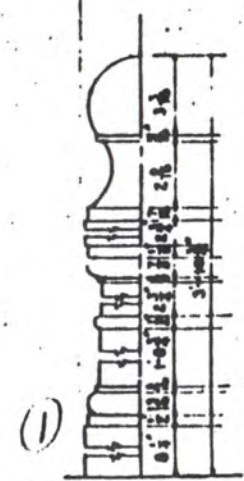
/2 ELEV. OF START NEWEL 2ND FLOOR STAIRS TO ATTIC SCALE 3/4" 1-0"
